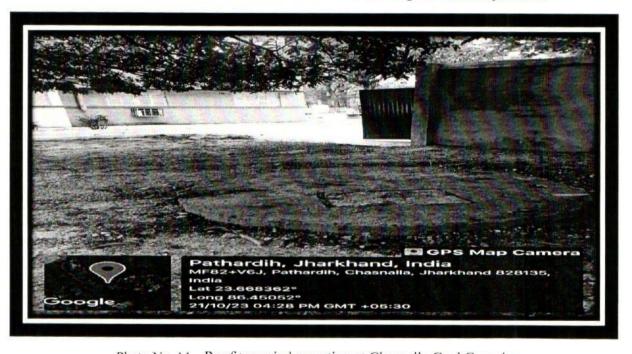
Roof top rain harvesting at Chasnalla Coal Complex
